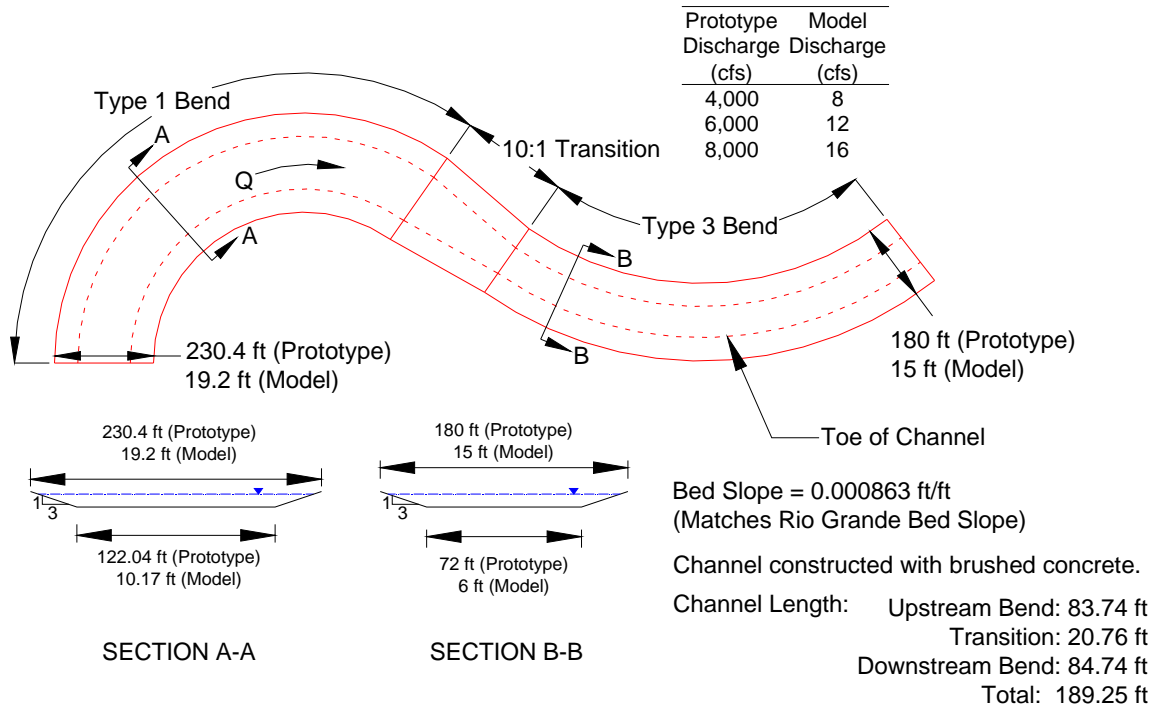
Model Layout of the Type 1 and Type 3 Bends in Plan View
